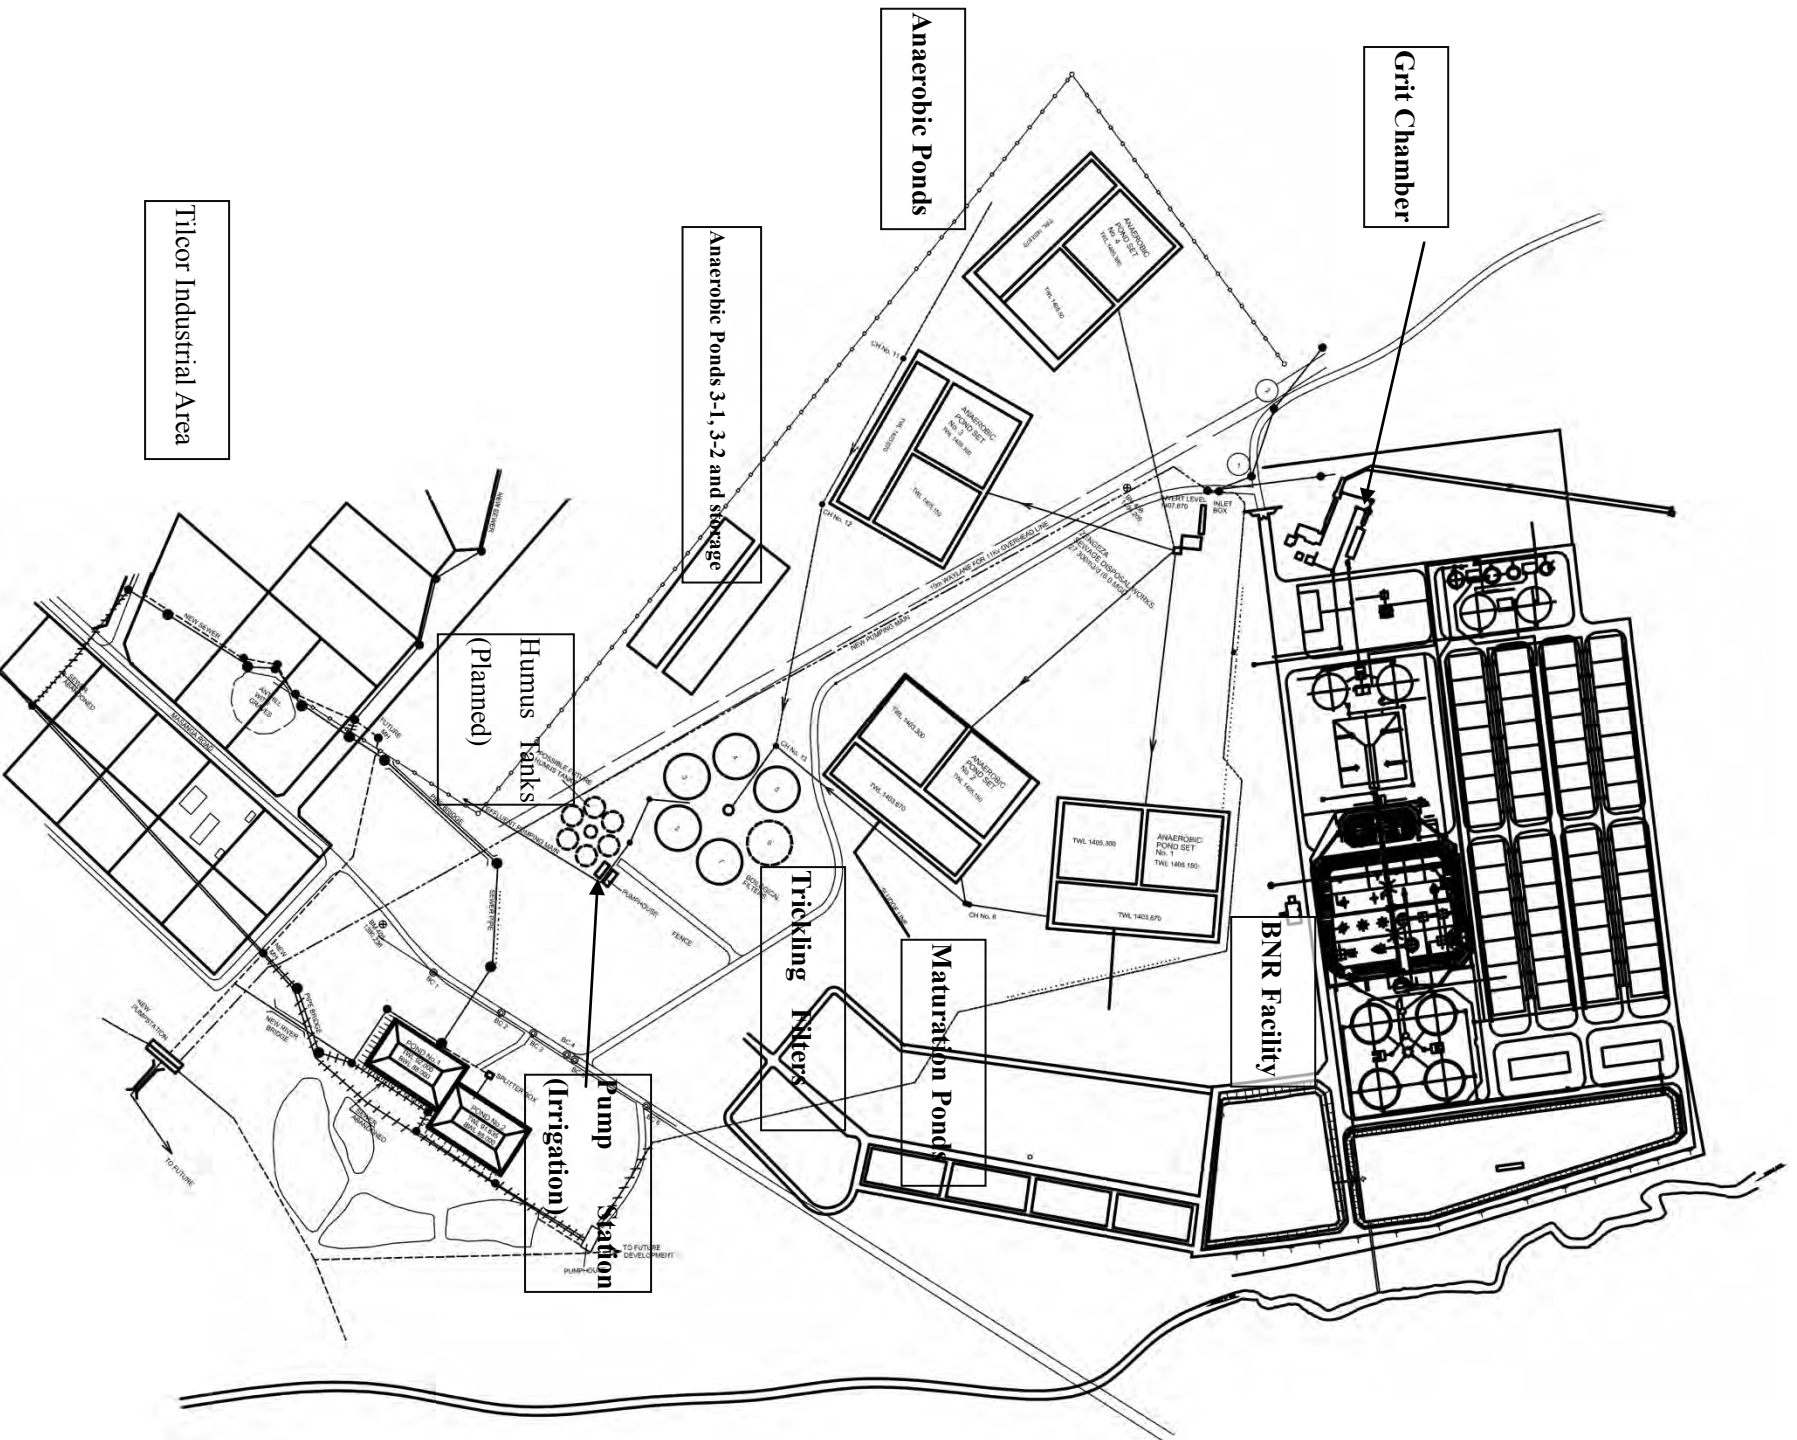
Plant Layout of the Zengeza STP Source: JICA Project Team
